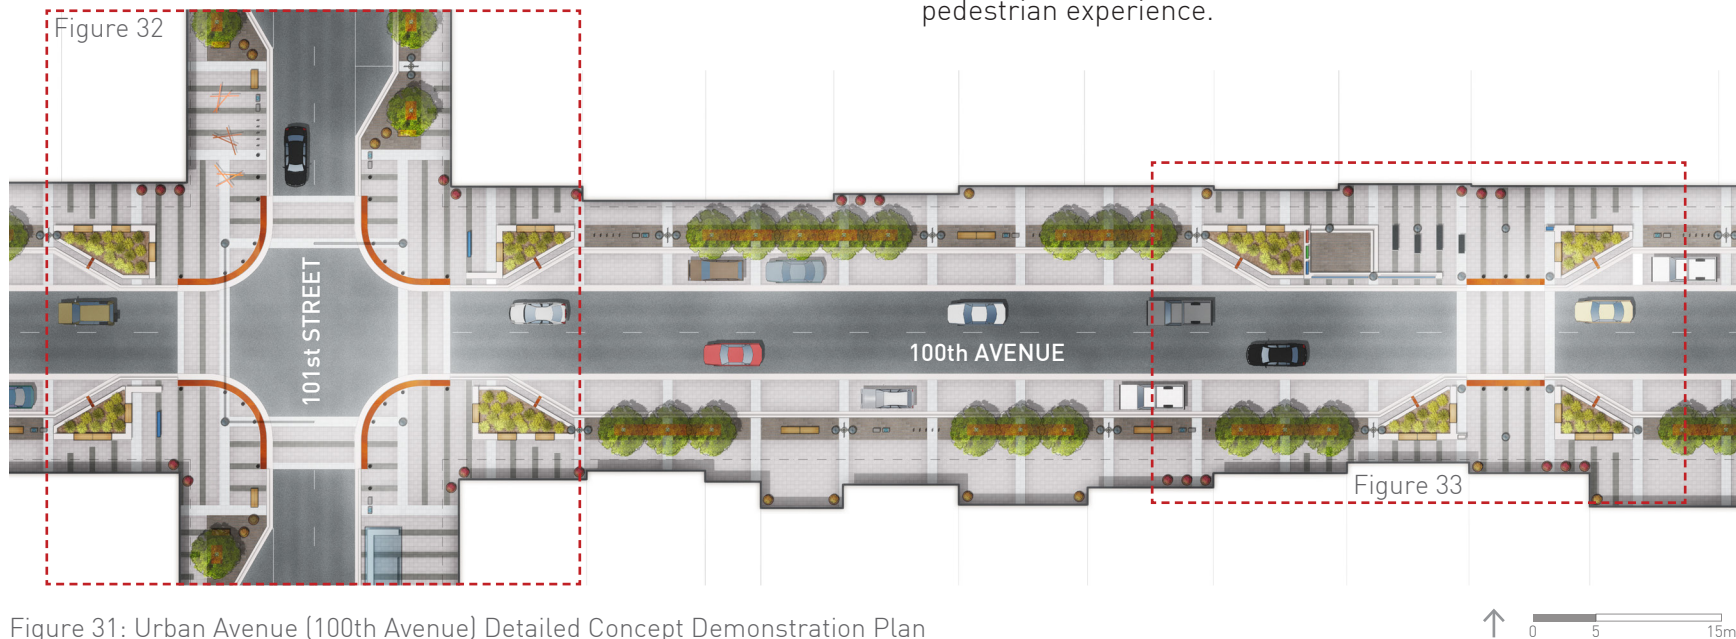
Urban Avenue (100th Avenue) Detailed Concept Demonstration Plan
